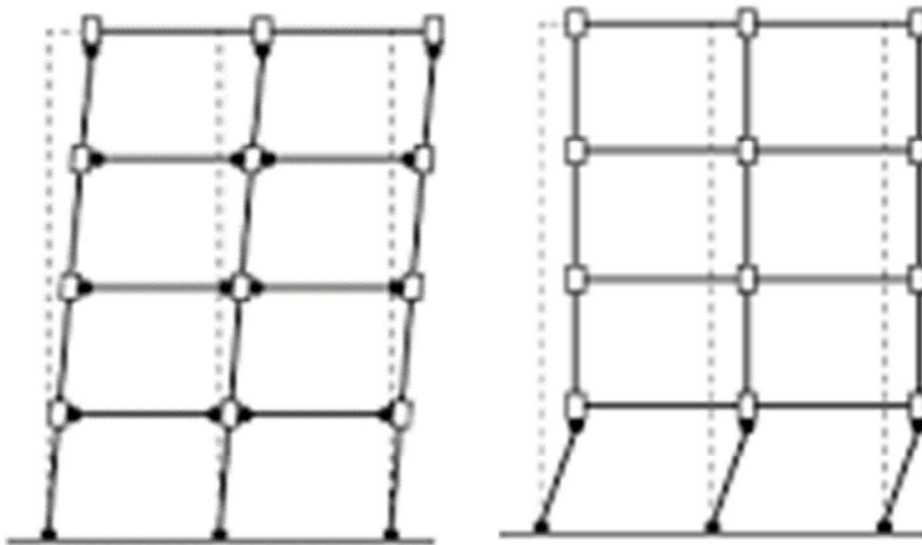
Black dots show failures. Left: failures in beams. The building could keep standing.
